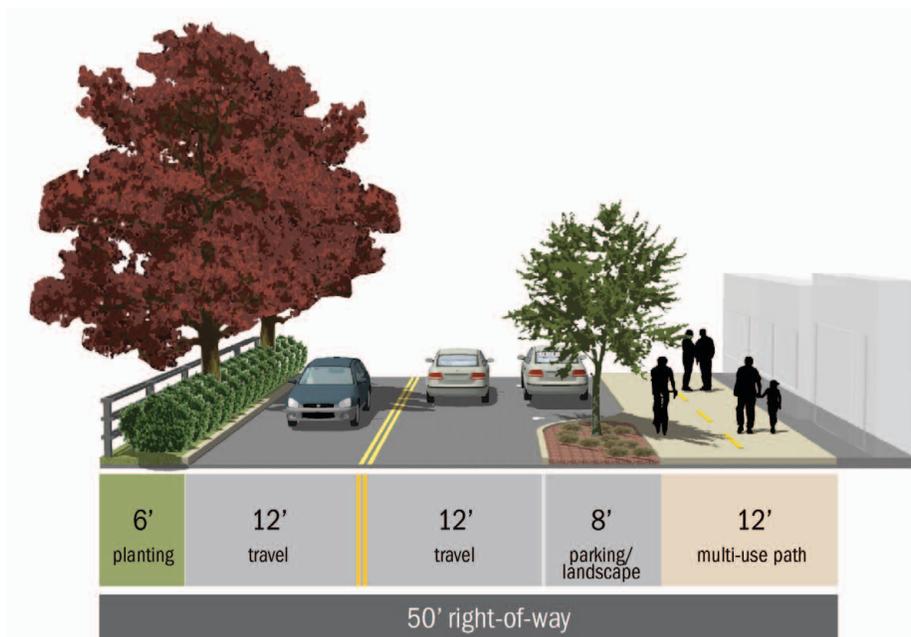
Conceptual Cross-Section for Main Street – Milport Road to Beta Street with additional right-of-way and multi-use
